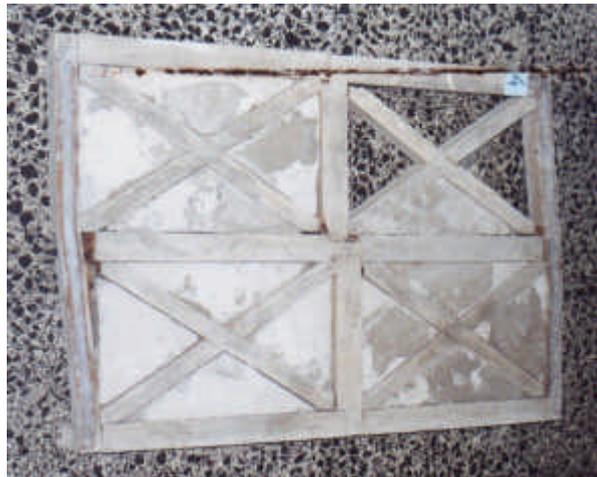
Strengthened wall panel after diagonal compression test (typical failure)
